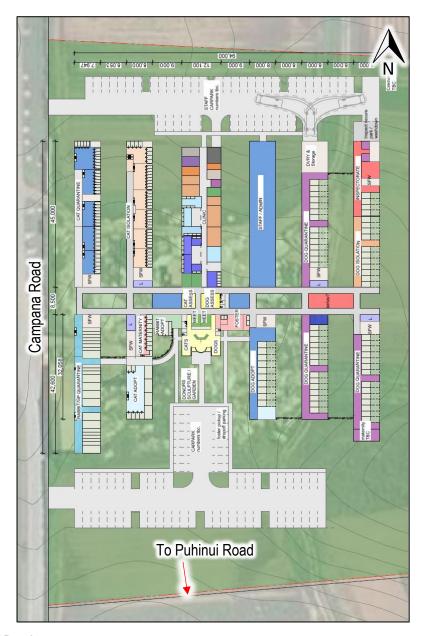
Proposed Development (Source: Site Plan by Chow Hill Architects)
